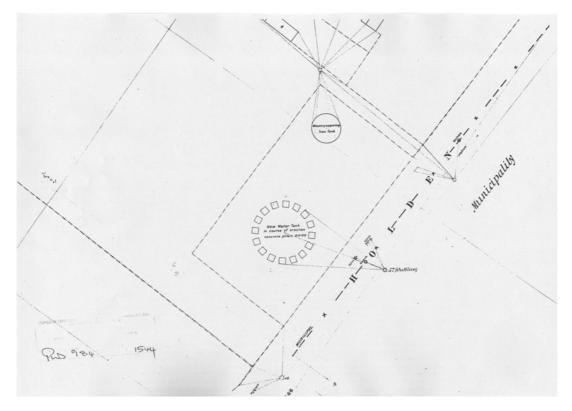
Excerpt from Archival Plan PWD Survey 1890
